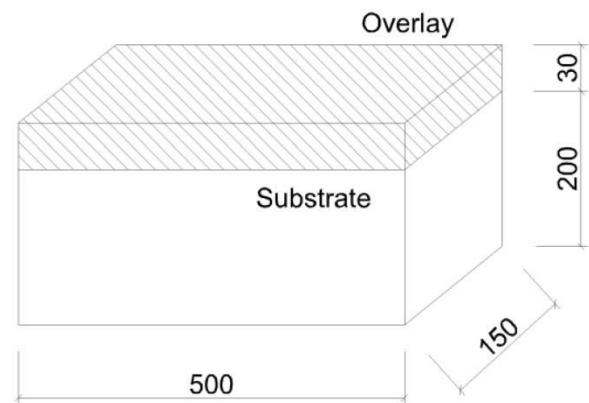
Repair material on the overlay composite beam and concrete substrate (unit in mm) [11, 12].
